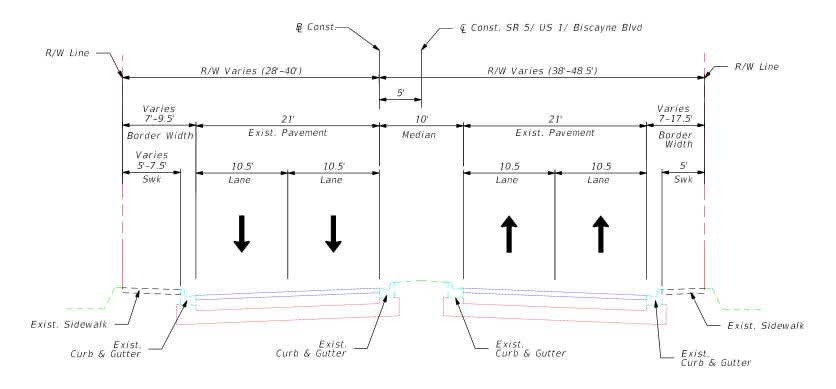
Existing Typical Section from NE 88th Street to NE 90th Street
